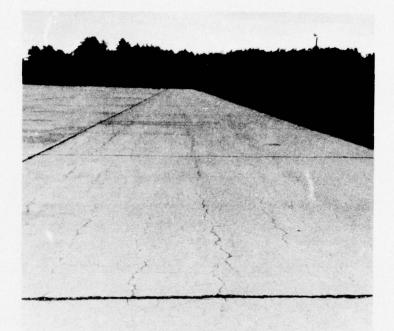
Typical longitudinal cracking (as in parking aprons A and B)
